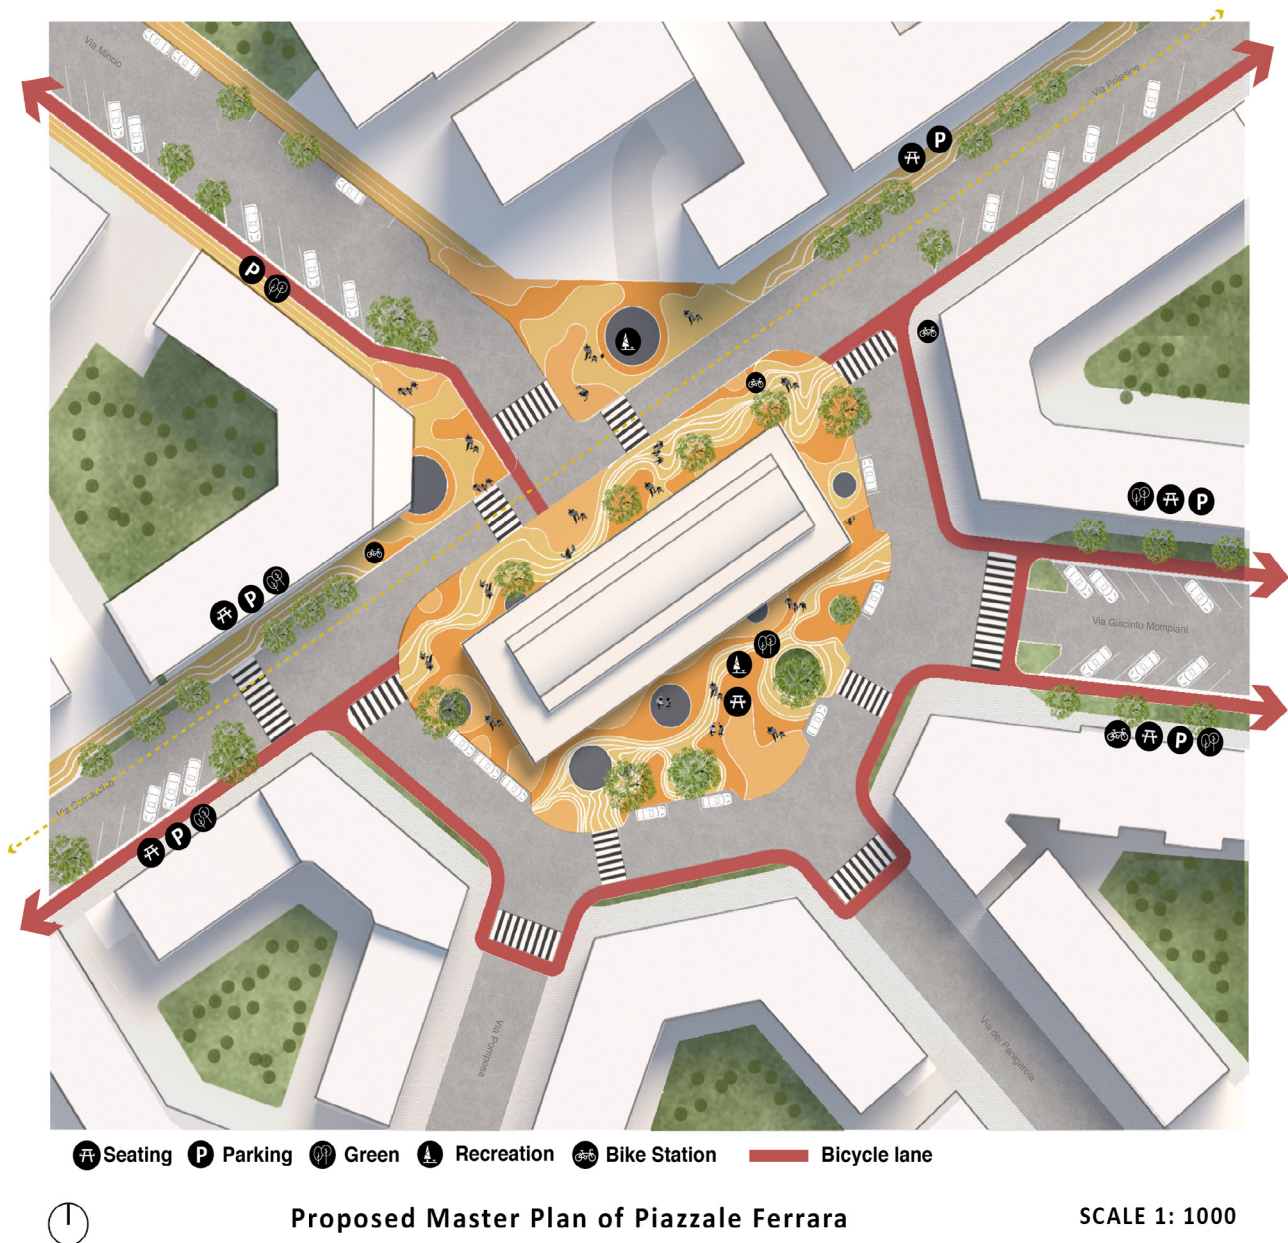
Proposed Master plan of Piazza Ferrara , Corvetto
